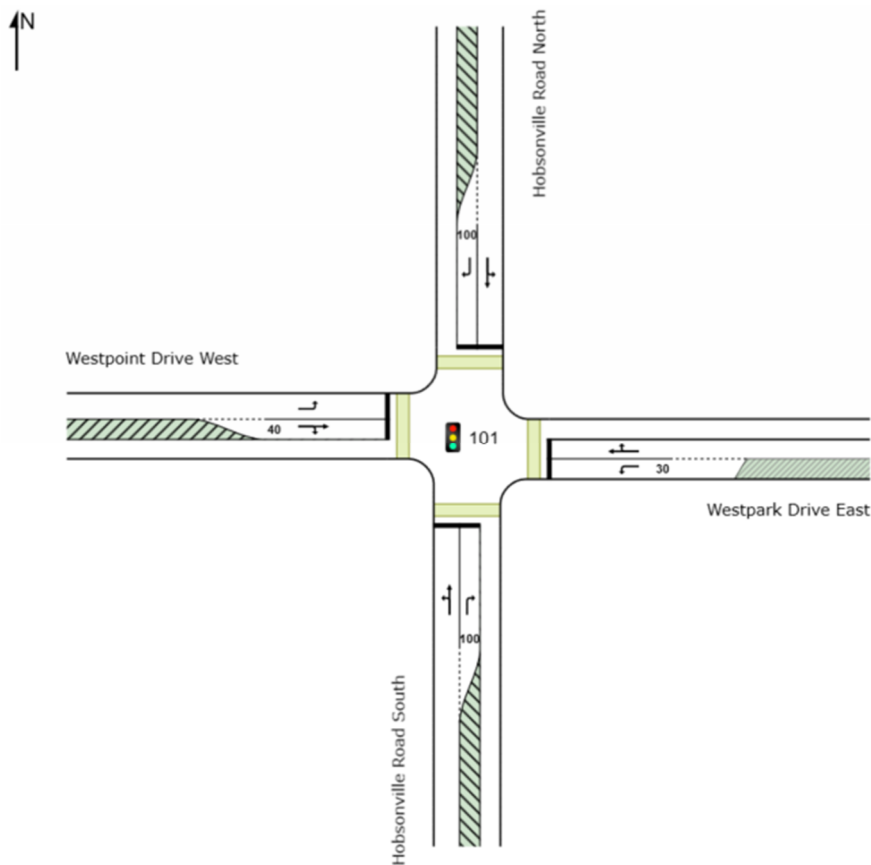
EXISTING INTERSECTION ARRANGEMENT
